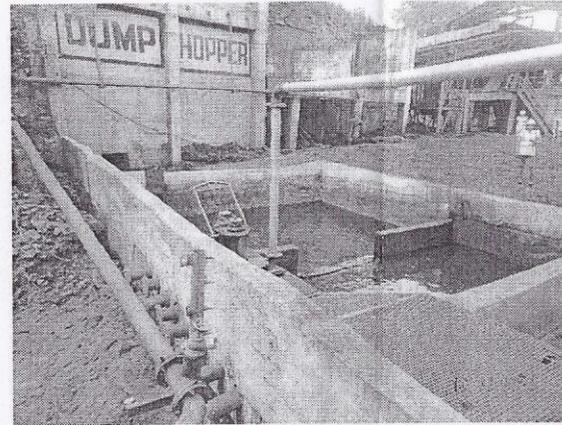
Photo of tank in the project just adjacent to river where water from project and outside accumulates
